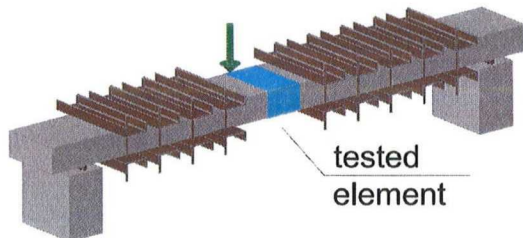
Test set-up for experiments on inter-crack elements on a structural member
